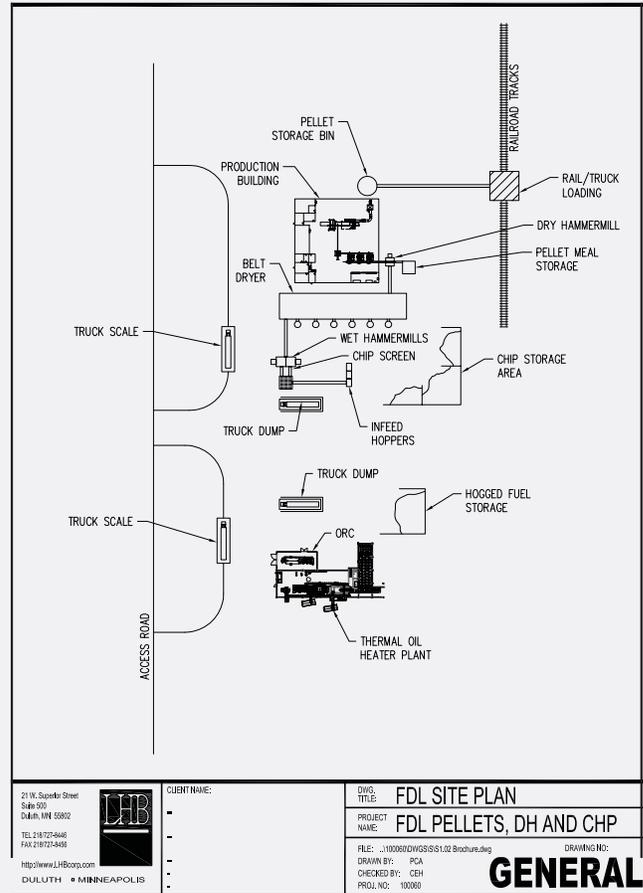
Fond du Lac site plan. Courtesy of the LHB Corporation.
